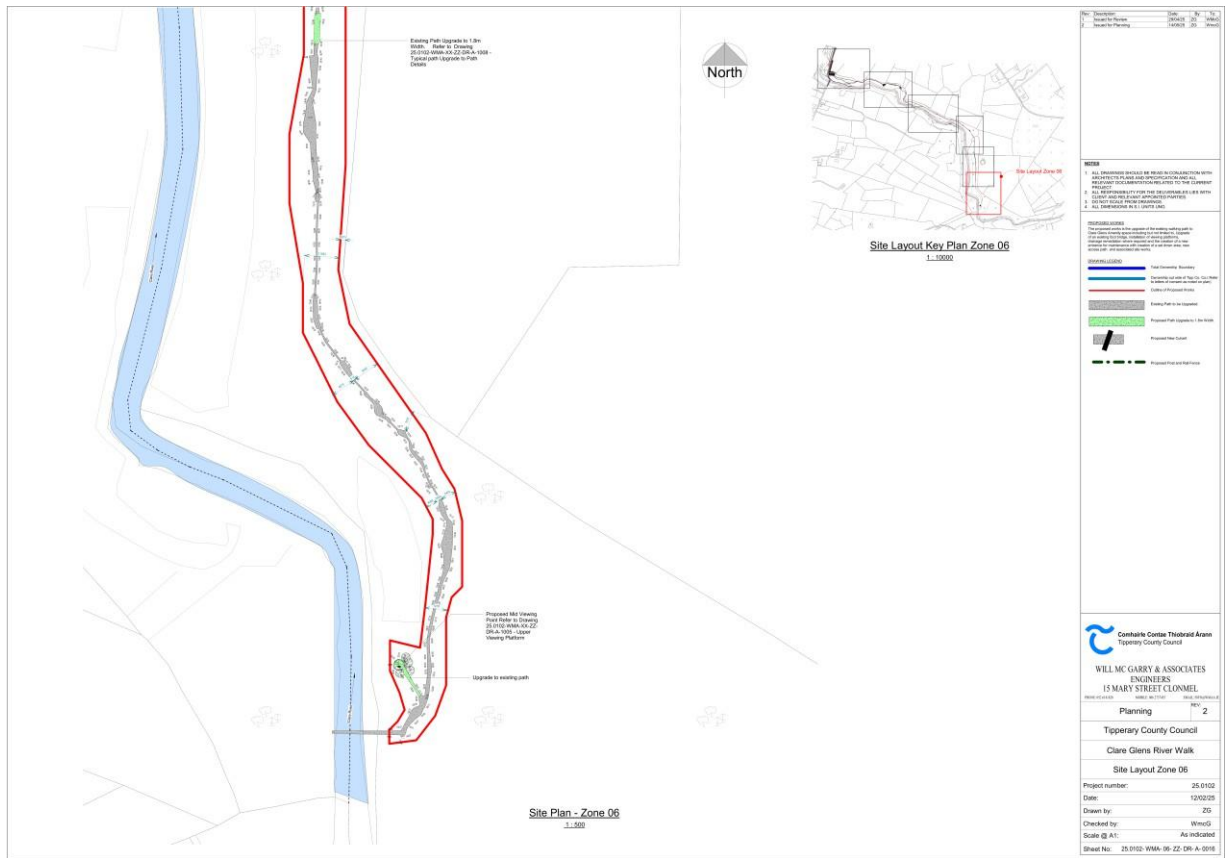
Site drawing - details of section 6 (viewing platform 2 and end of trail)
